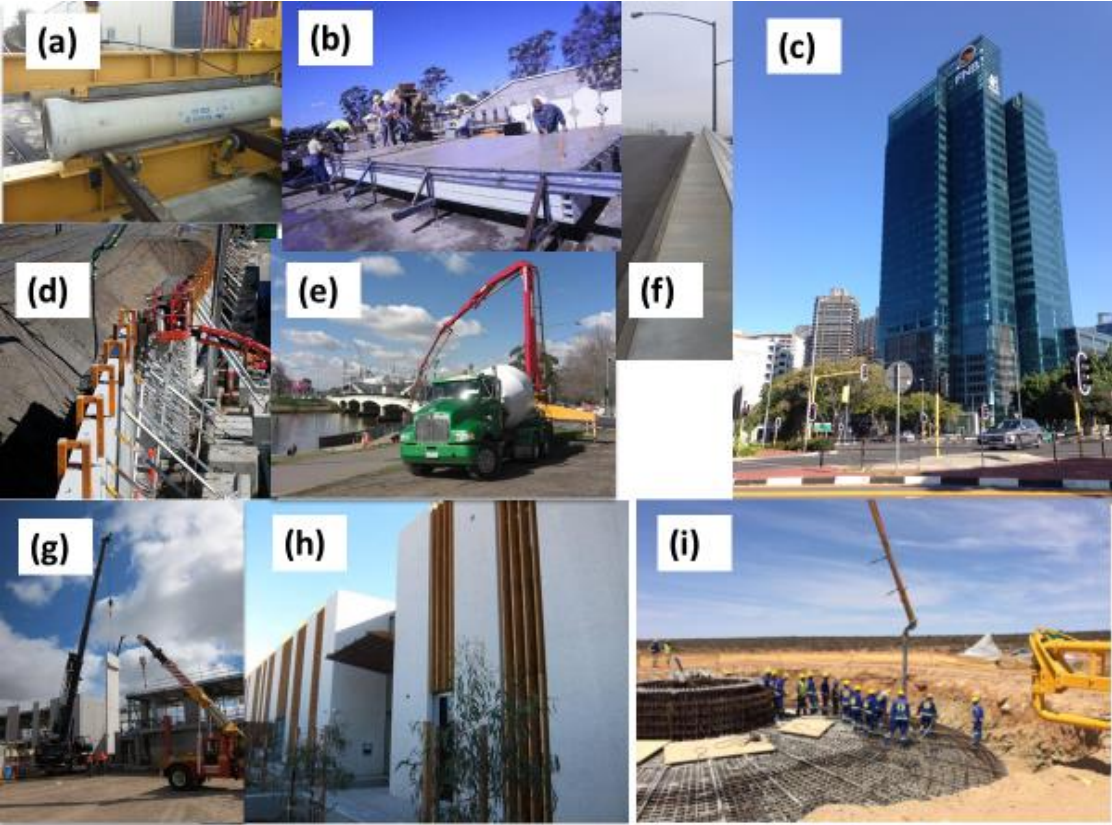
Selected examples of AC projects in Australia and South Africa: (a) Pipes produced by Reinforced Concrete Pipes of Australia (RCPA), (b) Bridge deck cast in Queensland, (c) Portside building in Cape Town, South Africa constructed by Murray & Roberts, (d) Retainer wall for Regional Rail Link project in Melbourne, (e) Embankment for Swan Street Bridge in Melbourne, (f) Bridge deck panels for Salmon Street Bridge in Port Melbourne, (g) and (h) Precast panels and general concrete works for Melton Library, Melbourne, (i) Foundations for windfarms at west coast of South Africa constructed by Murray & Roberts
